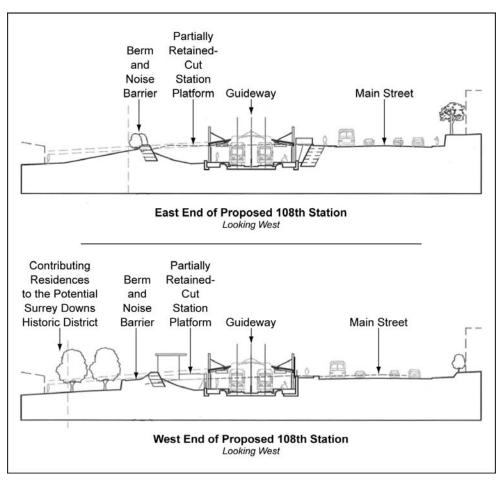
Cross-Section of Proposed 108th Station
